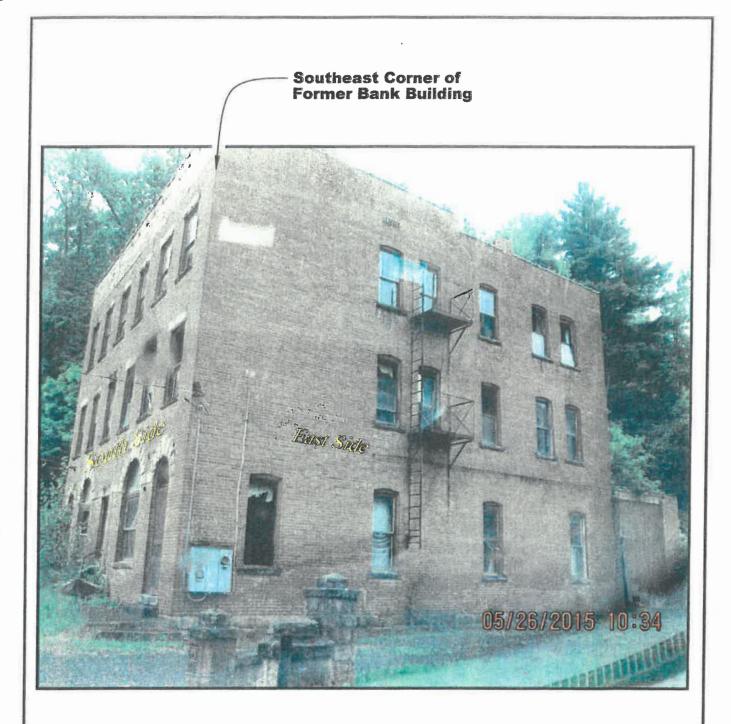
LOCATION OF COLLAPSED FORMER BANK BUILDING
